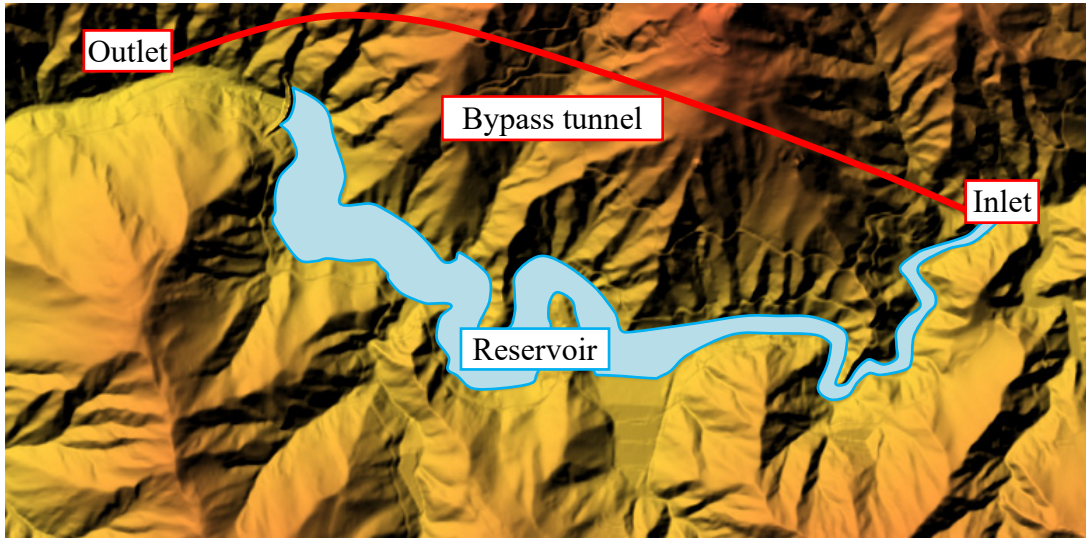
Plan view of the bypass tunnel at the Asahi Dam
